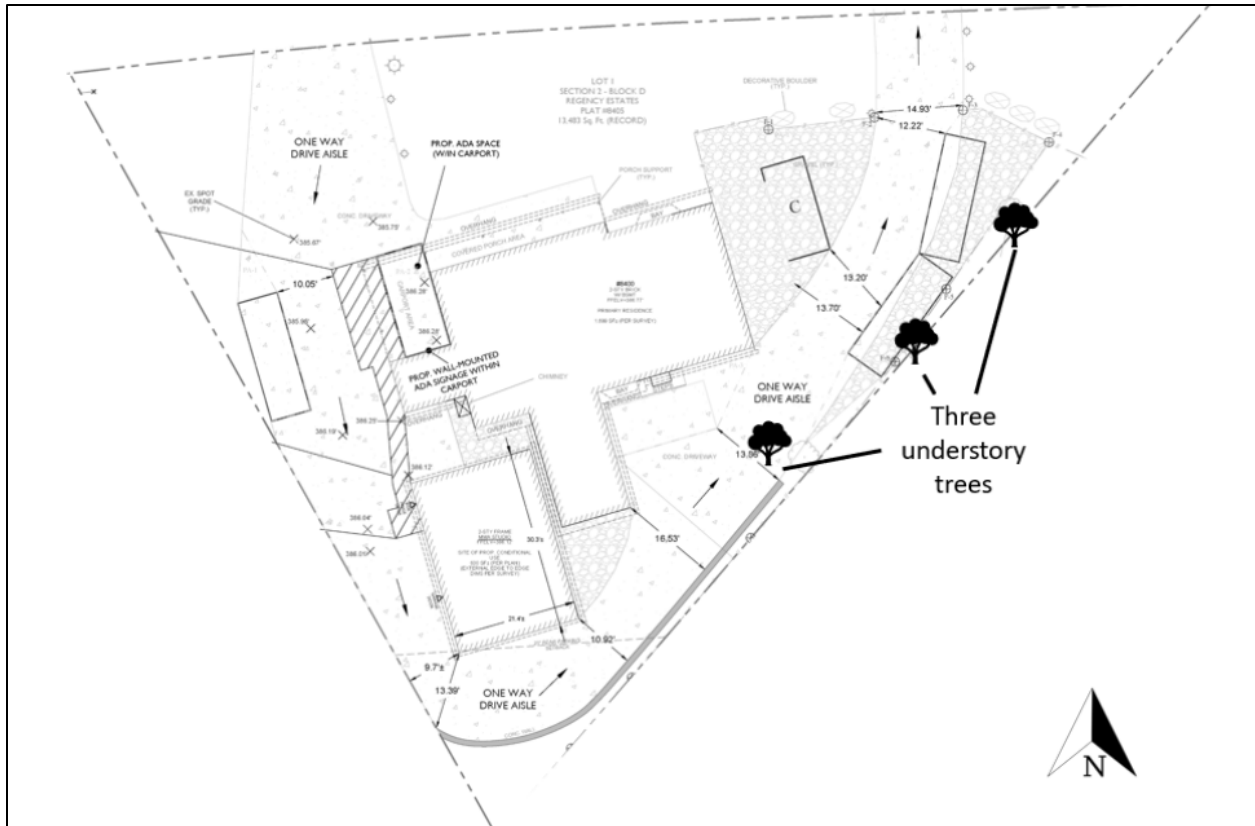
Parking Lot Layout Exhibit, modified by staff showing placement of proposed understory trees.
